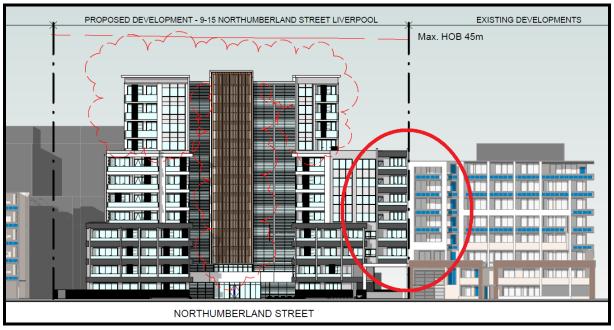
Elevation Plan showing Zero Side Setback to Northern Boundary circled in red
